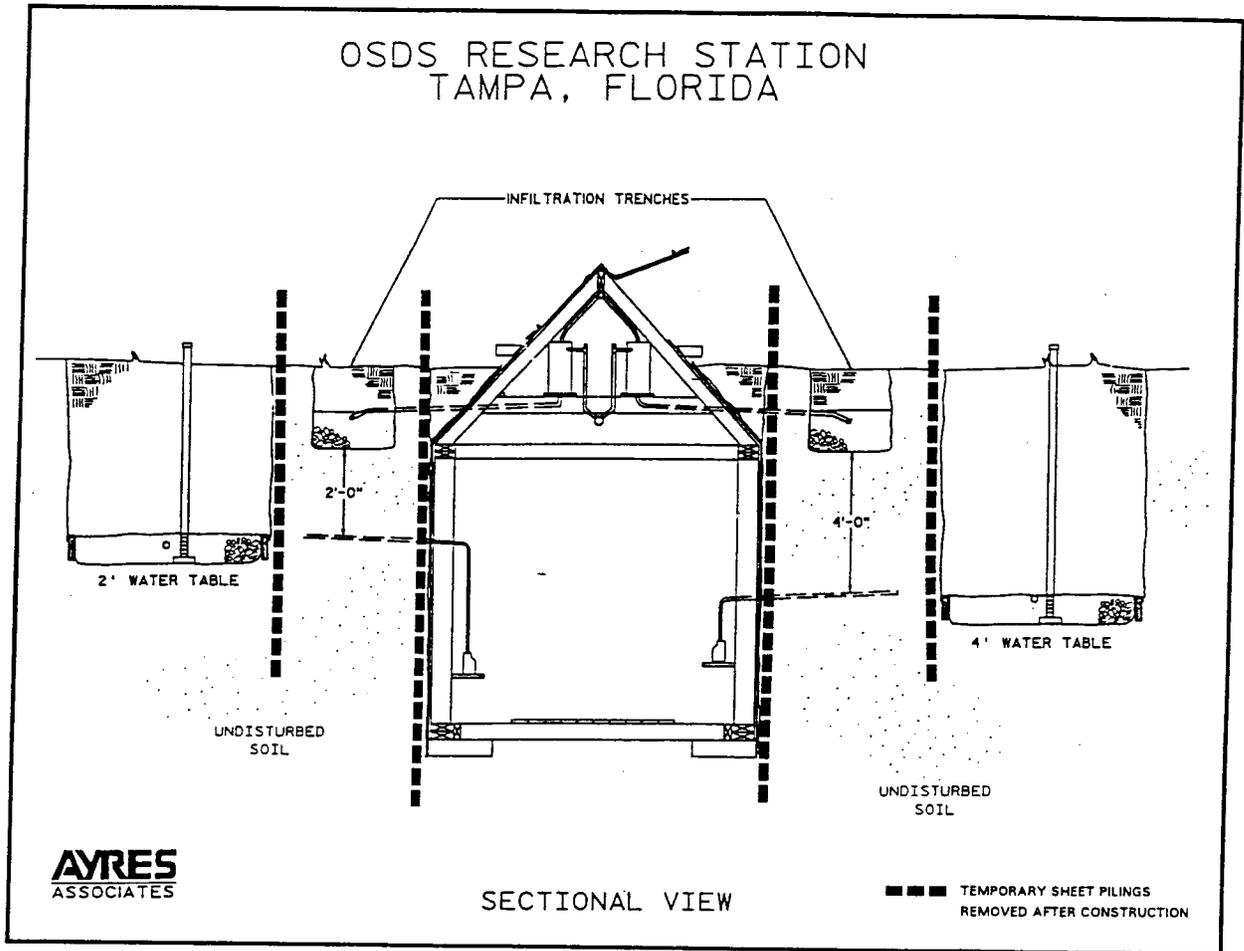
Sectional View of Lysimeter Station Facility.
